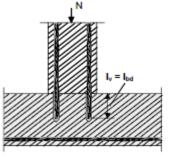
rebar connection components stressed primarily compression; rebar is stressed in compression
